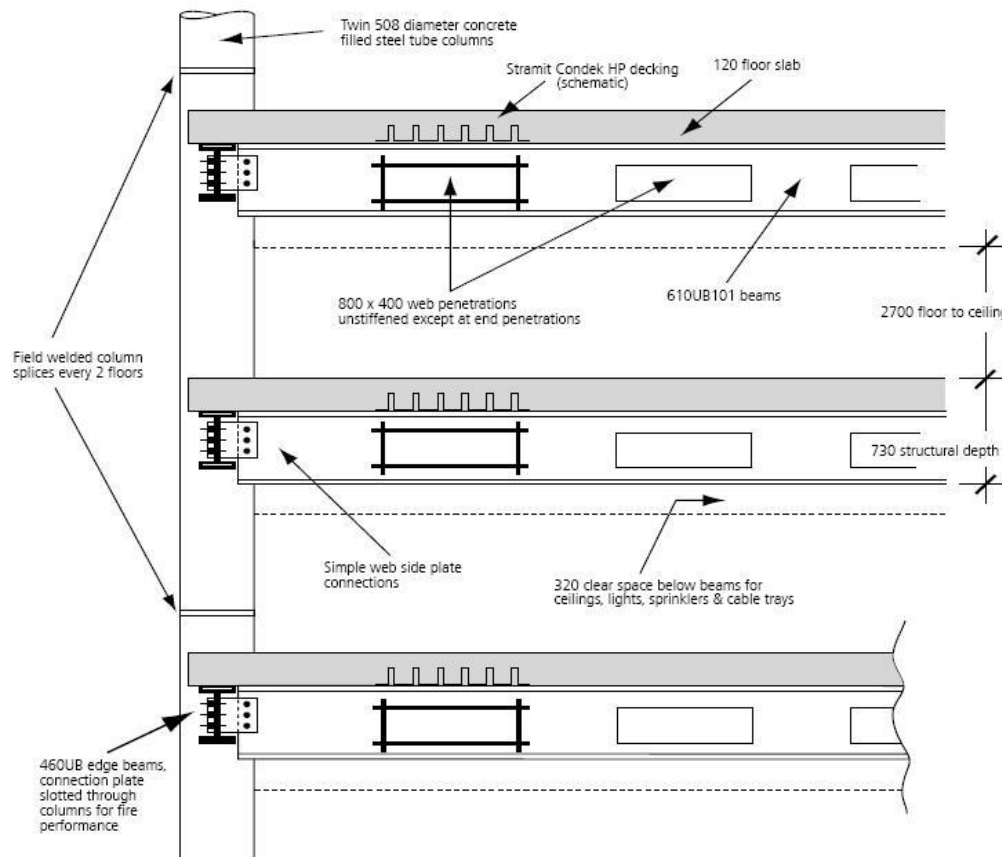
Floor system of a building with CCFT columns (Davids and Merriel, 2004)
